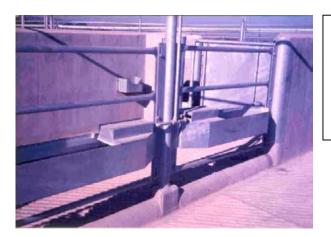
Tubular rails and concrete walls for pen partition, nonslip concrete floor
